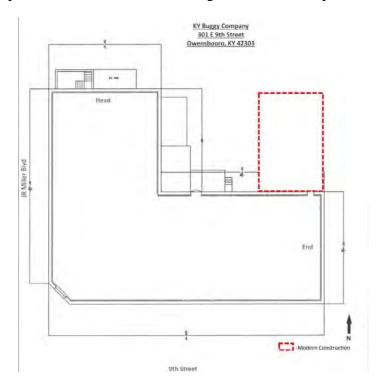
Plan of KBC building. "Head" refers to north end of ell. "End" refers to east end of the ell.
